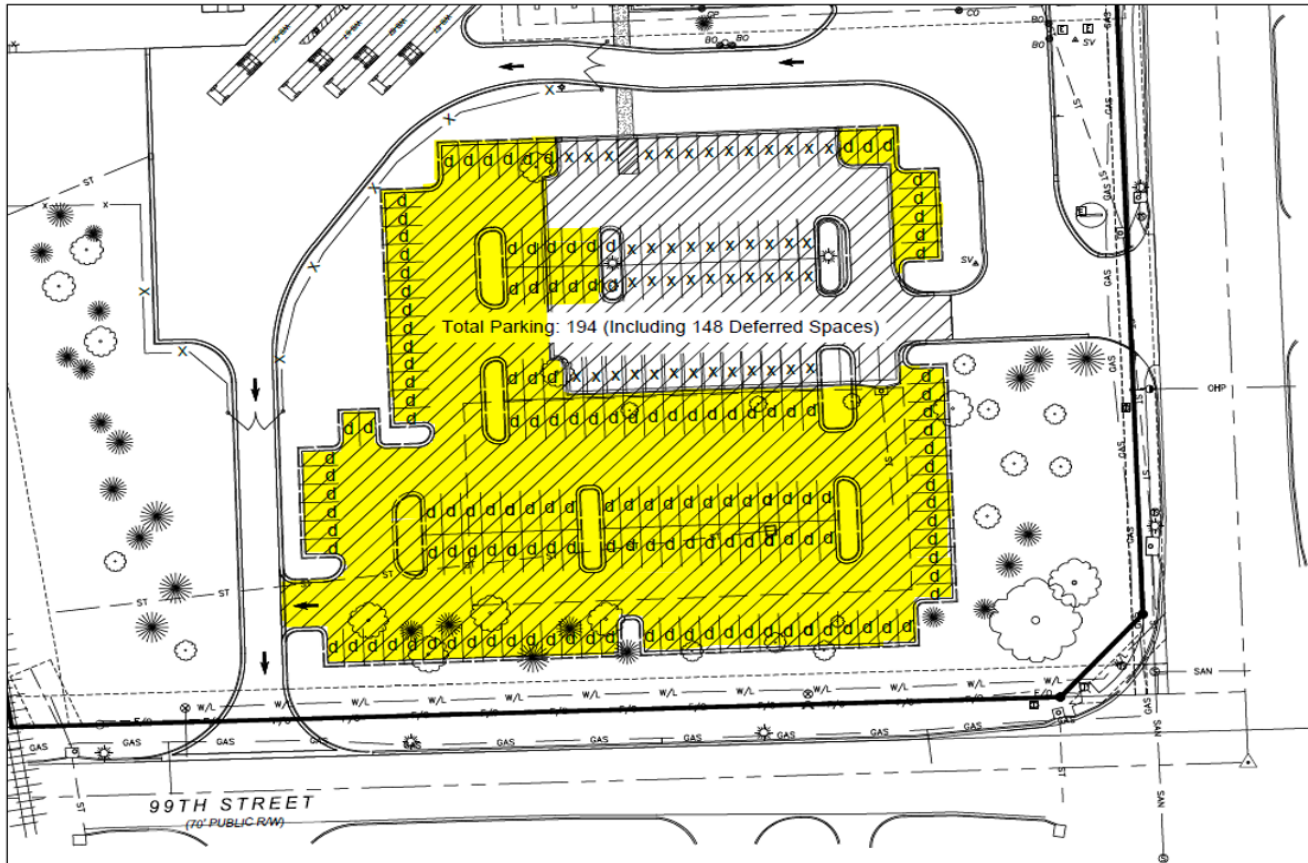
Deferred Parking Plan Detail, with proposed deferred parking shown in yellow.
